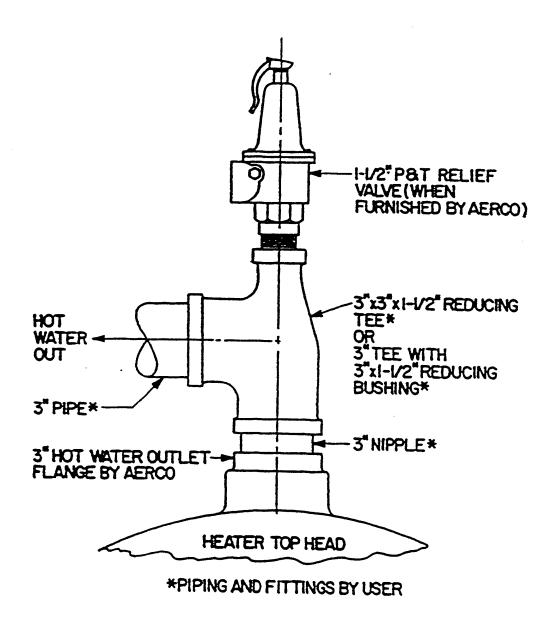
P&T Relief Valve Located in the Heater Hot Water Outlet Piping
